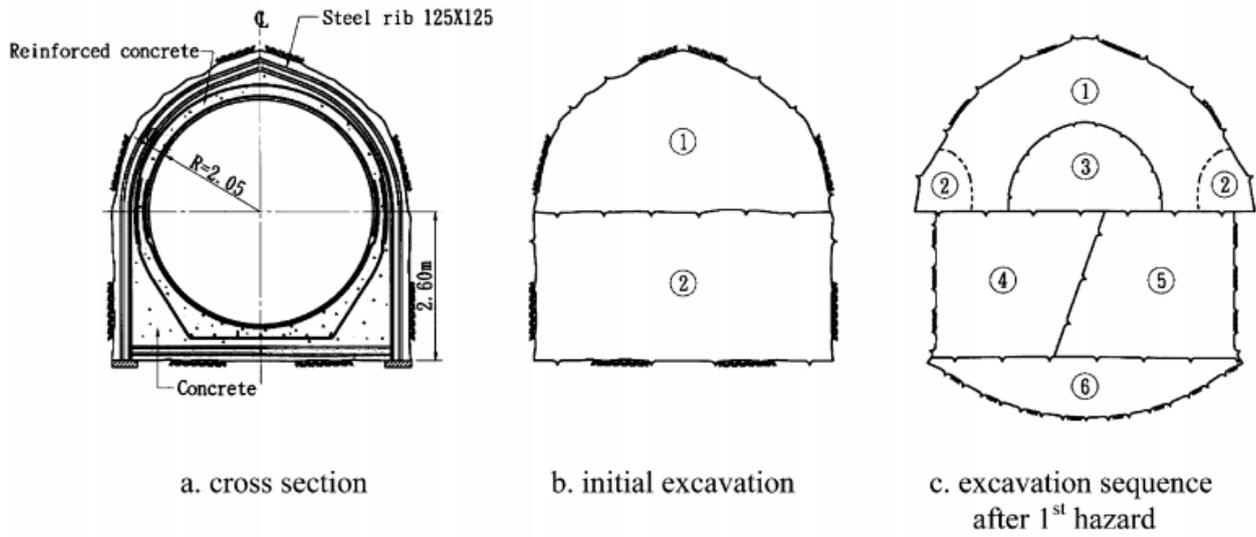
Cross-section and Excavation Sequence of the Pressure Tunnel of Wushantou Reservoir
